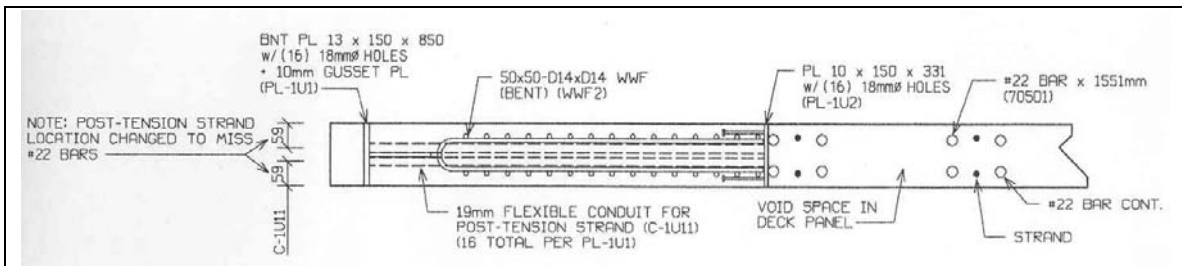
NU-Deck end panel section at post-tensioning ducts (NDOR, 2003)
